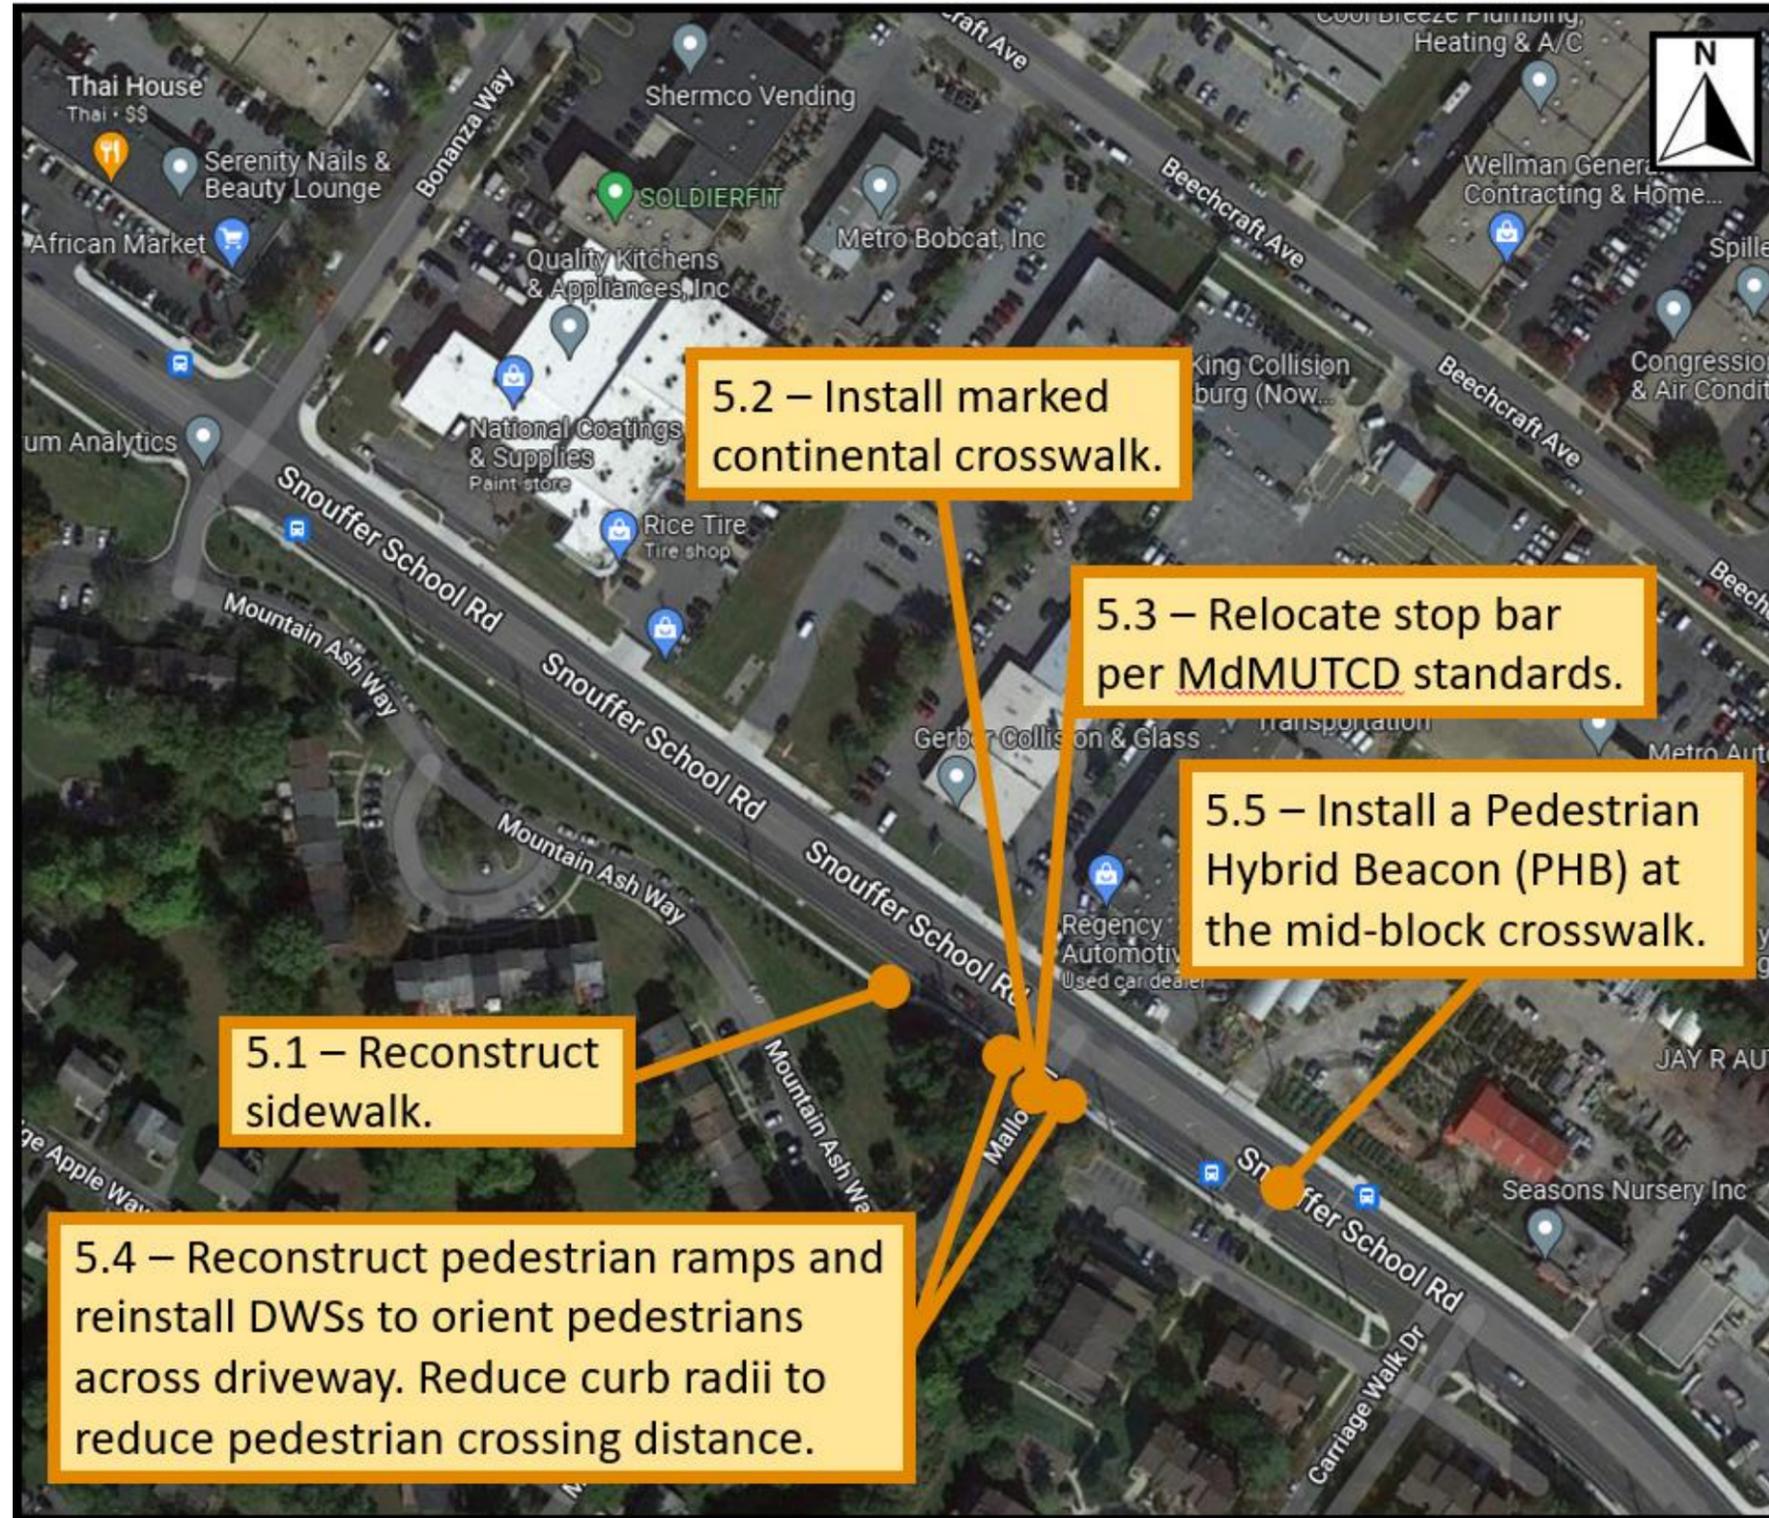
MCDOT – Specific Recommendations: Snouffer School Road at Carriage Walk Drive
